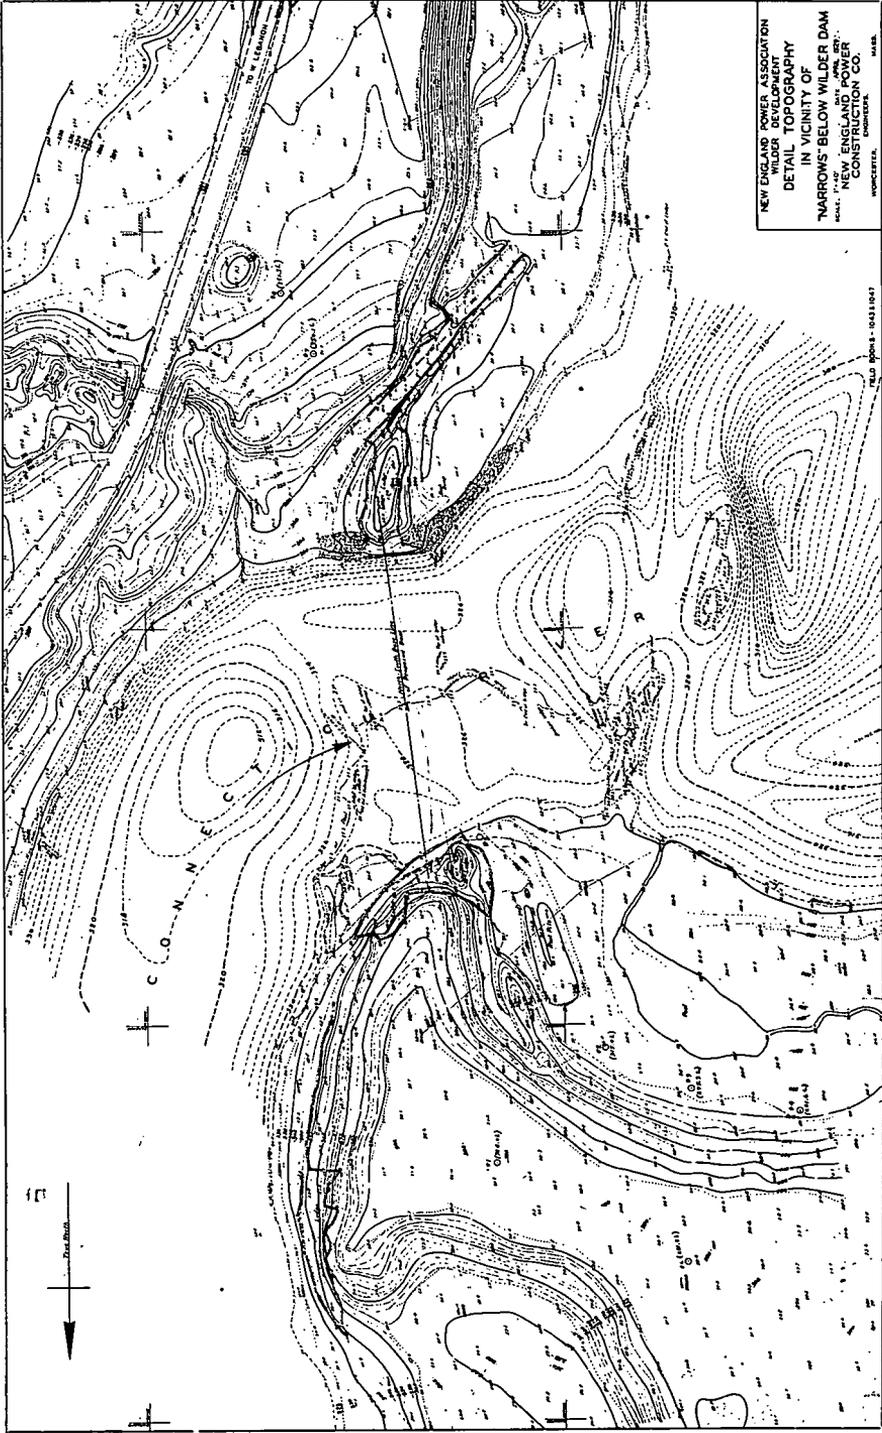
NARROWS DAMSITE AND PRESENT WILDER PLANT.
